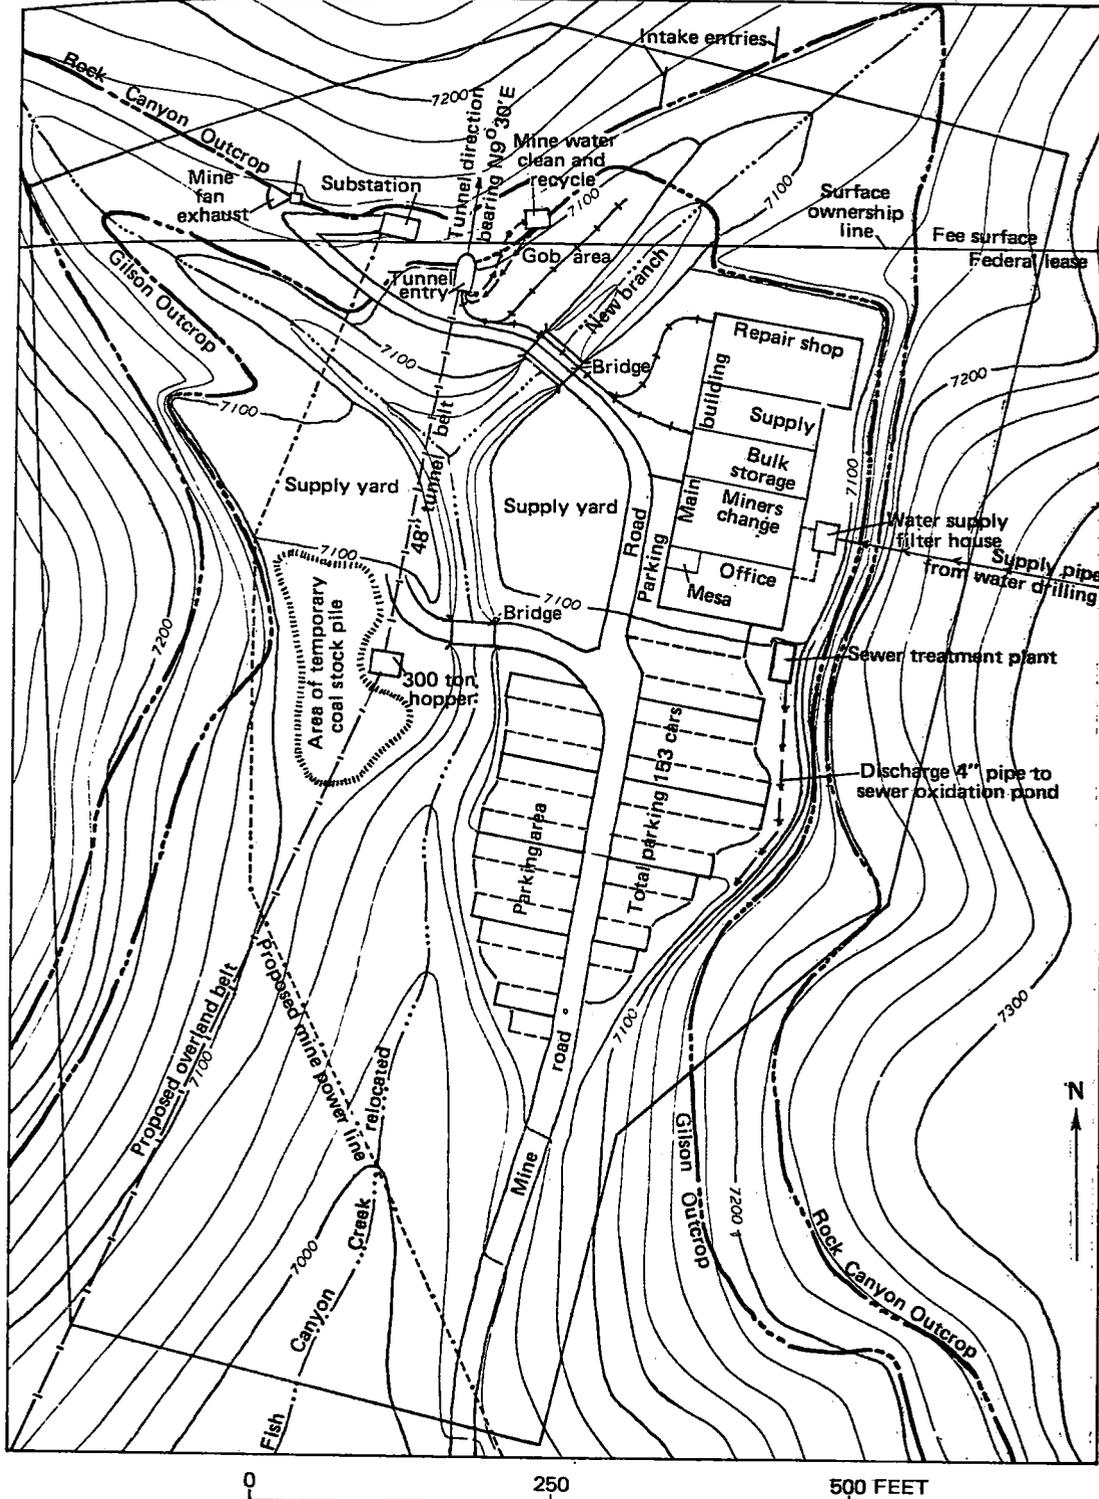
Proposed layout of surface facilities at the Fish Creek minesite in sec. 21, T. 12 S., R. 13 E., showing final topography after site preparation.
